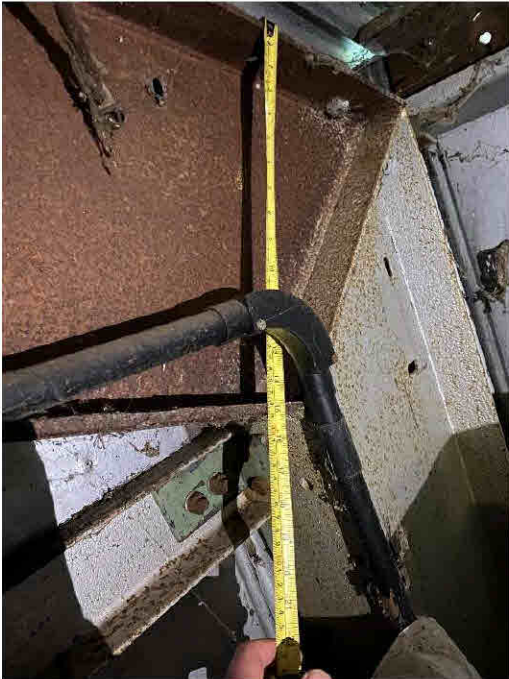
Close Up of Cover Plate Splice Connection to Rafter. Note Surface Corrosion to Steelwork. Rafter Depth Approx. 200mm.
